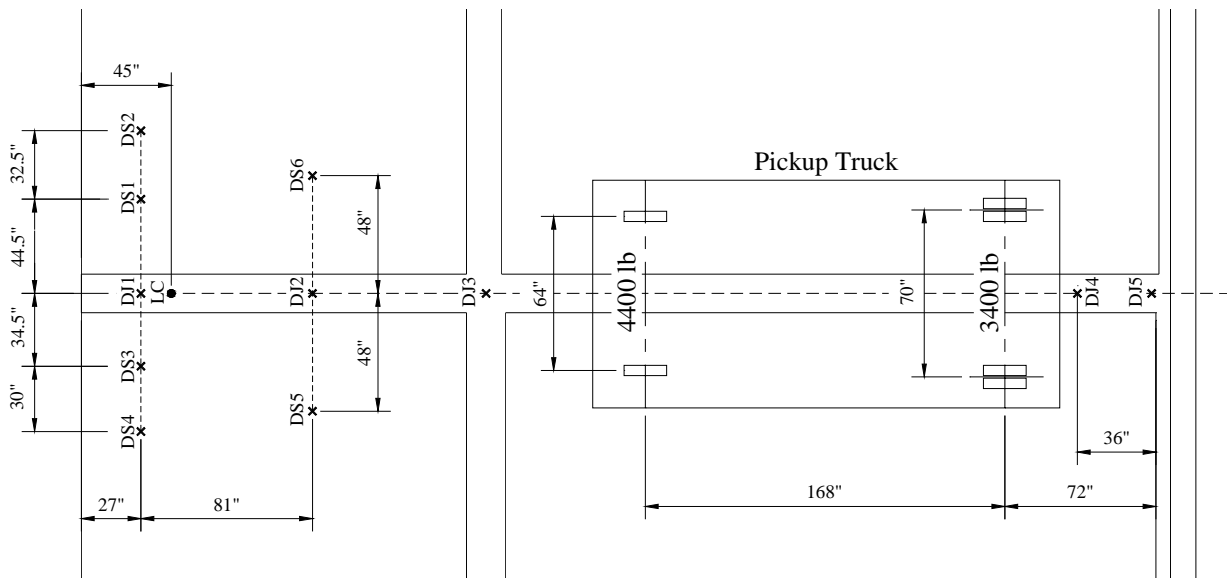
LVDTs Layout for Load Test 2 (Not to Scale)
